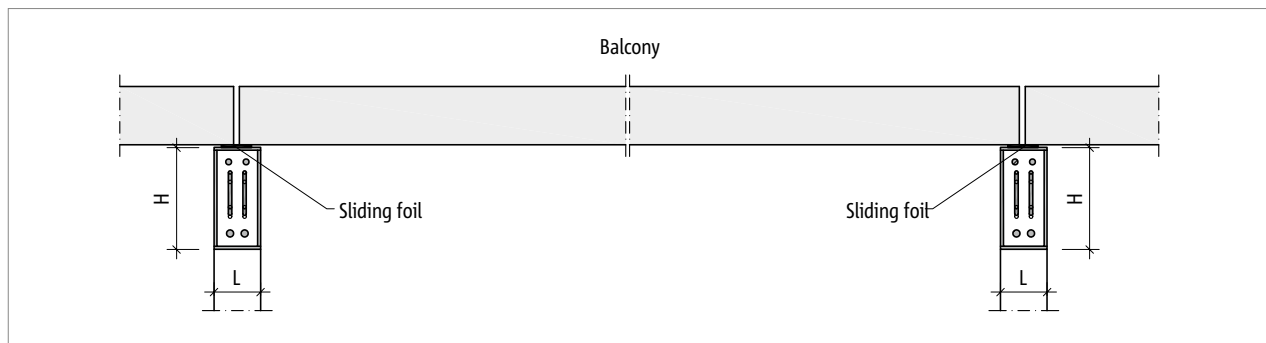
Schöck Isokorb® T type B: Cross-section; fatigue resistance via the sliding foil between the balcony slab and cantilevered beams
